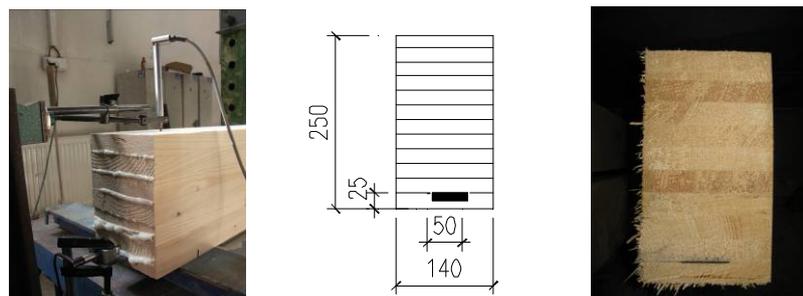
Test specimen made of laminated wood with glued-in lamella
